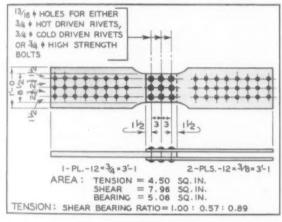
shows details of the structural joint used in the test at Northwestern University.
